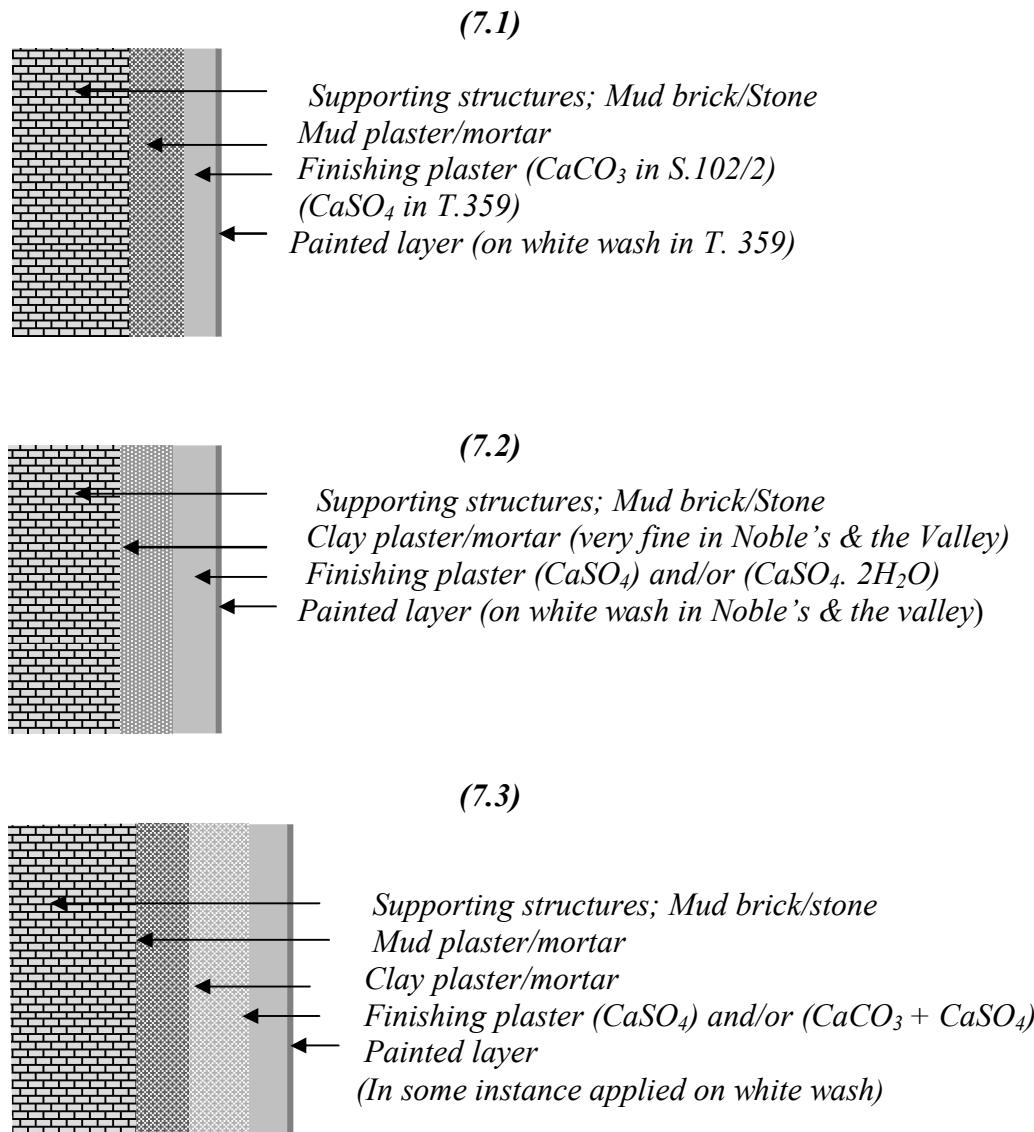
, the structure found in first Dynasty (E E) (supporting structure; mud brick) Saqqara and Deir El Medina T. 359 and T. 414 (supporting structure; stone) Luxor.
